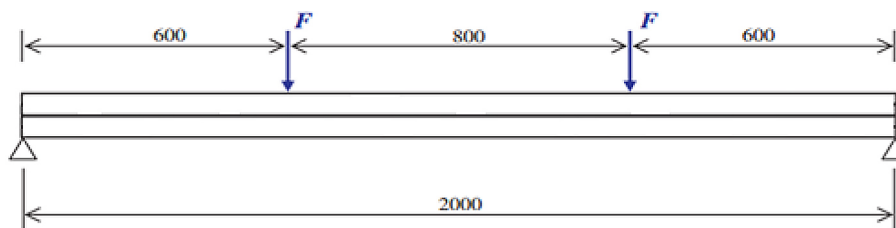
Schematic of the four-point bending test arrangement (dimensions in mm)
